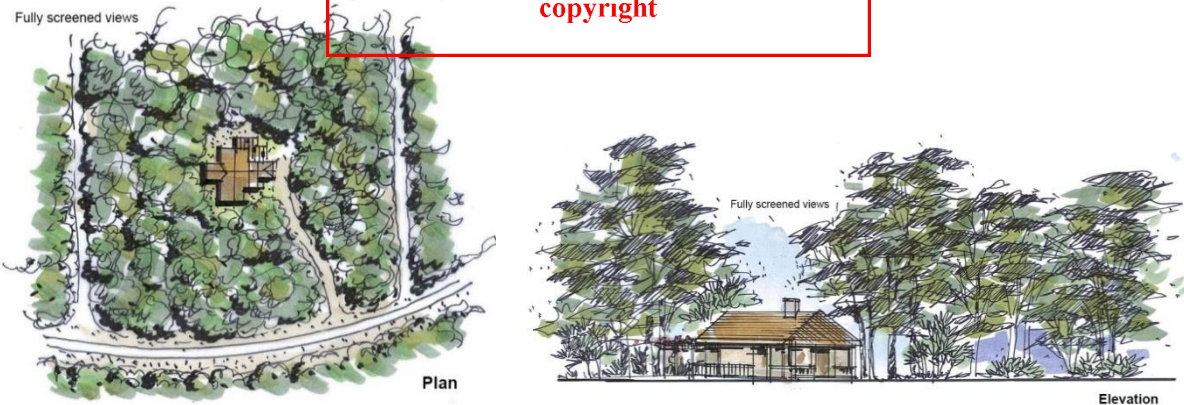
Typology 3 – Heavily screened. Typical plan and elevation.
